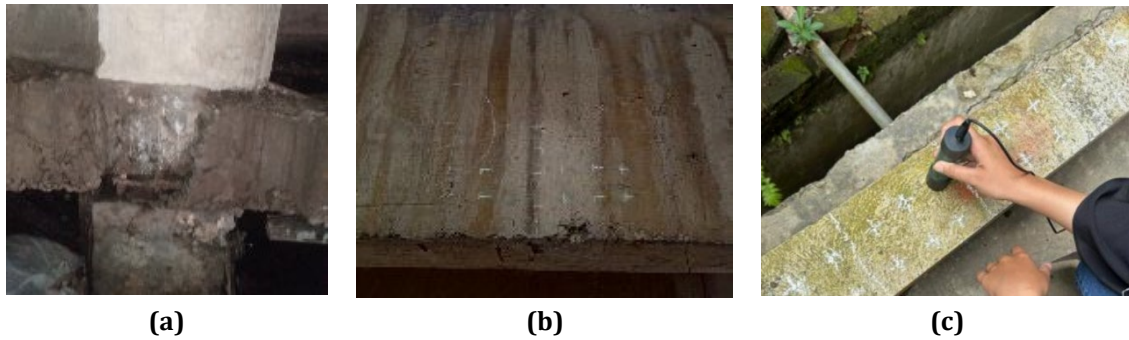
The equipment (a); UPV test on column (b); UPV test on floor slabs (c)
